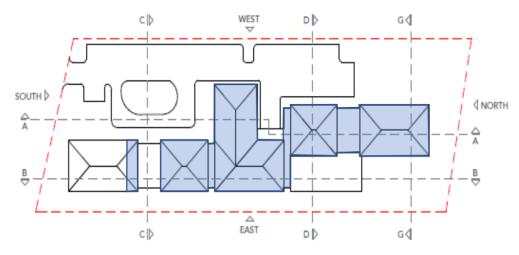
Section Plan Key, approximate extent of height breach outlined blue (Source: Team 2 Architects)
